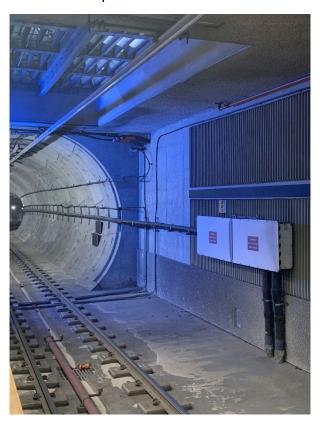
Los Angeles Metro 34.5 kV Trainway Feeder Installation at Little Tokyo Station Installed in 6-inch Fiberglass Resin Epoxy Conduit
